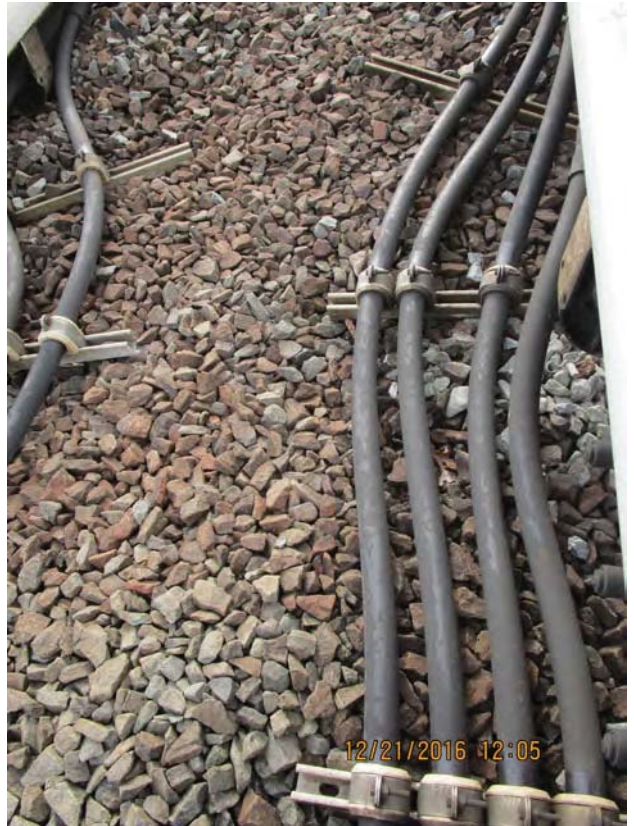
CABLES LAYING ON DECK (BALLAST) f
